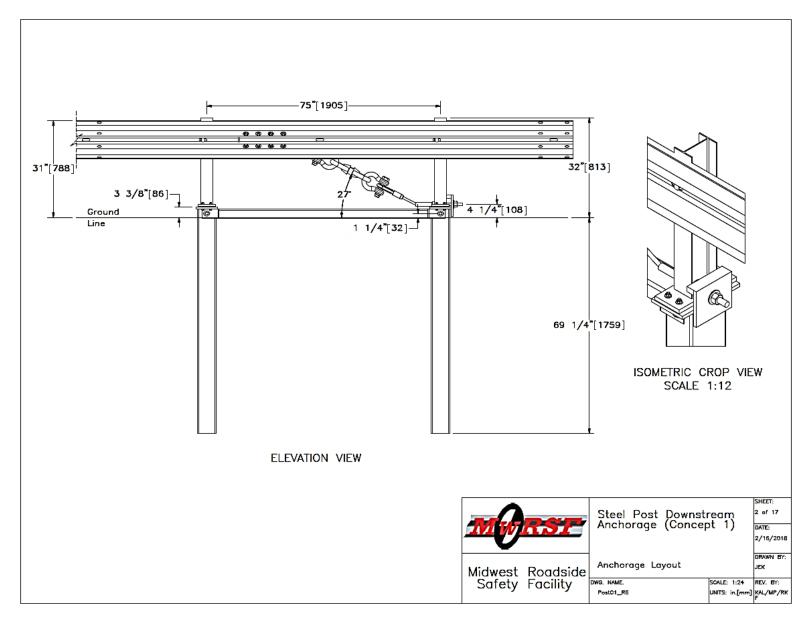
Steel-Post, Trailing-End Anchorage System, Concept No. 1 – Anchorage Layout
